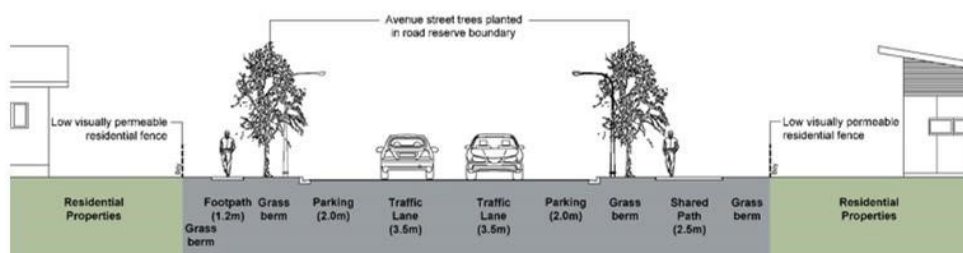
F: Cross section of Collector and Secondary Collector Roads in the General Residential Zone
